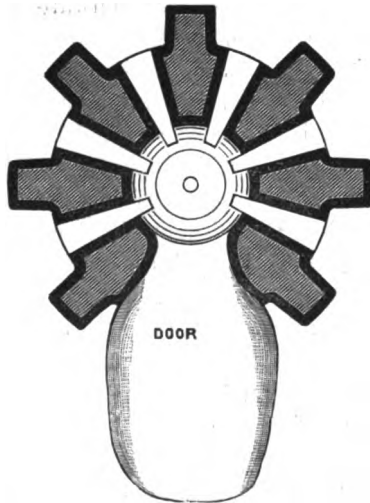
Plan. (Scale, $\frac{1}{4}$ inch to 1 foot.)
